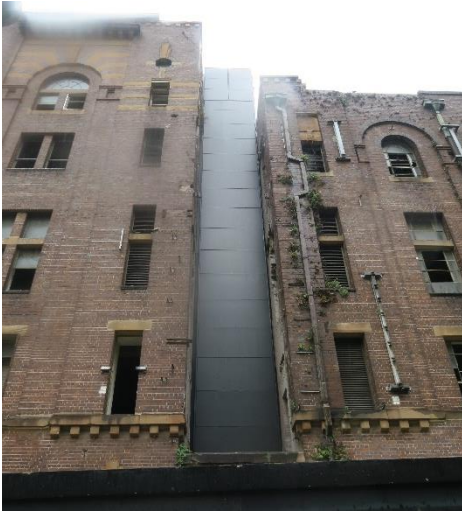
The eastern façade showing the inset stair block between buildings 22 (left) and 26 (right)
